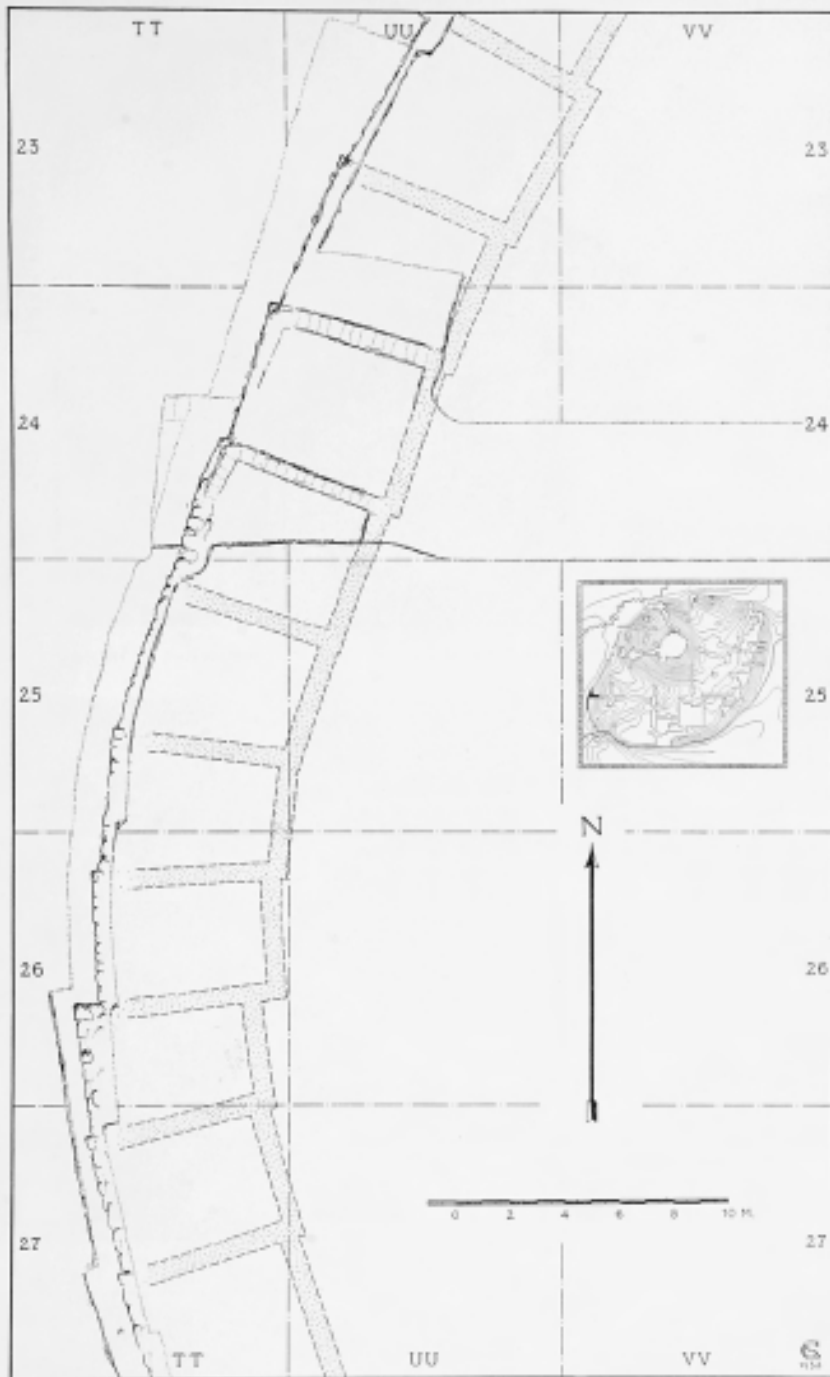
PLAN OF CITY WALL IN UU 23-TT 27. RECONSTRUCTED PARTS STIPPLED. SCALE, 1:200
